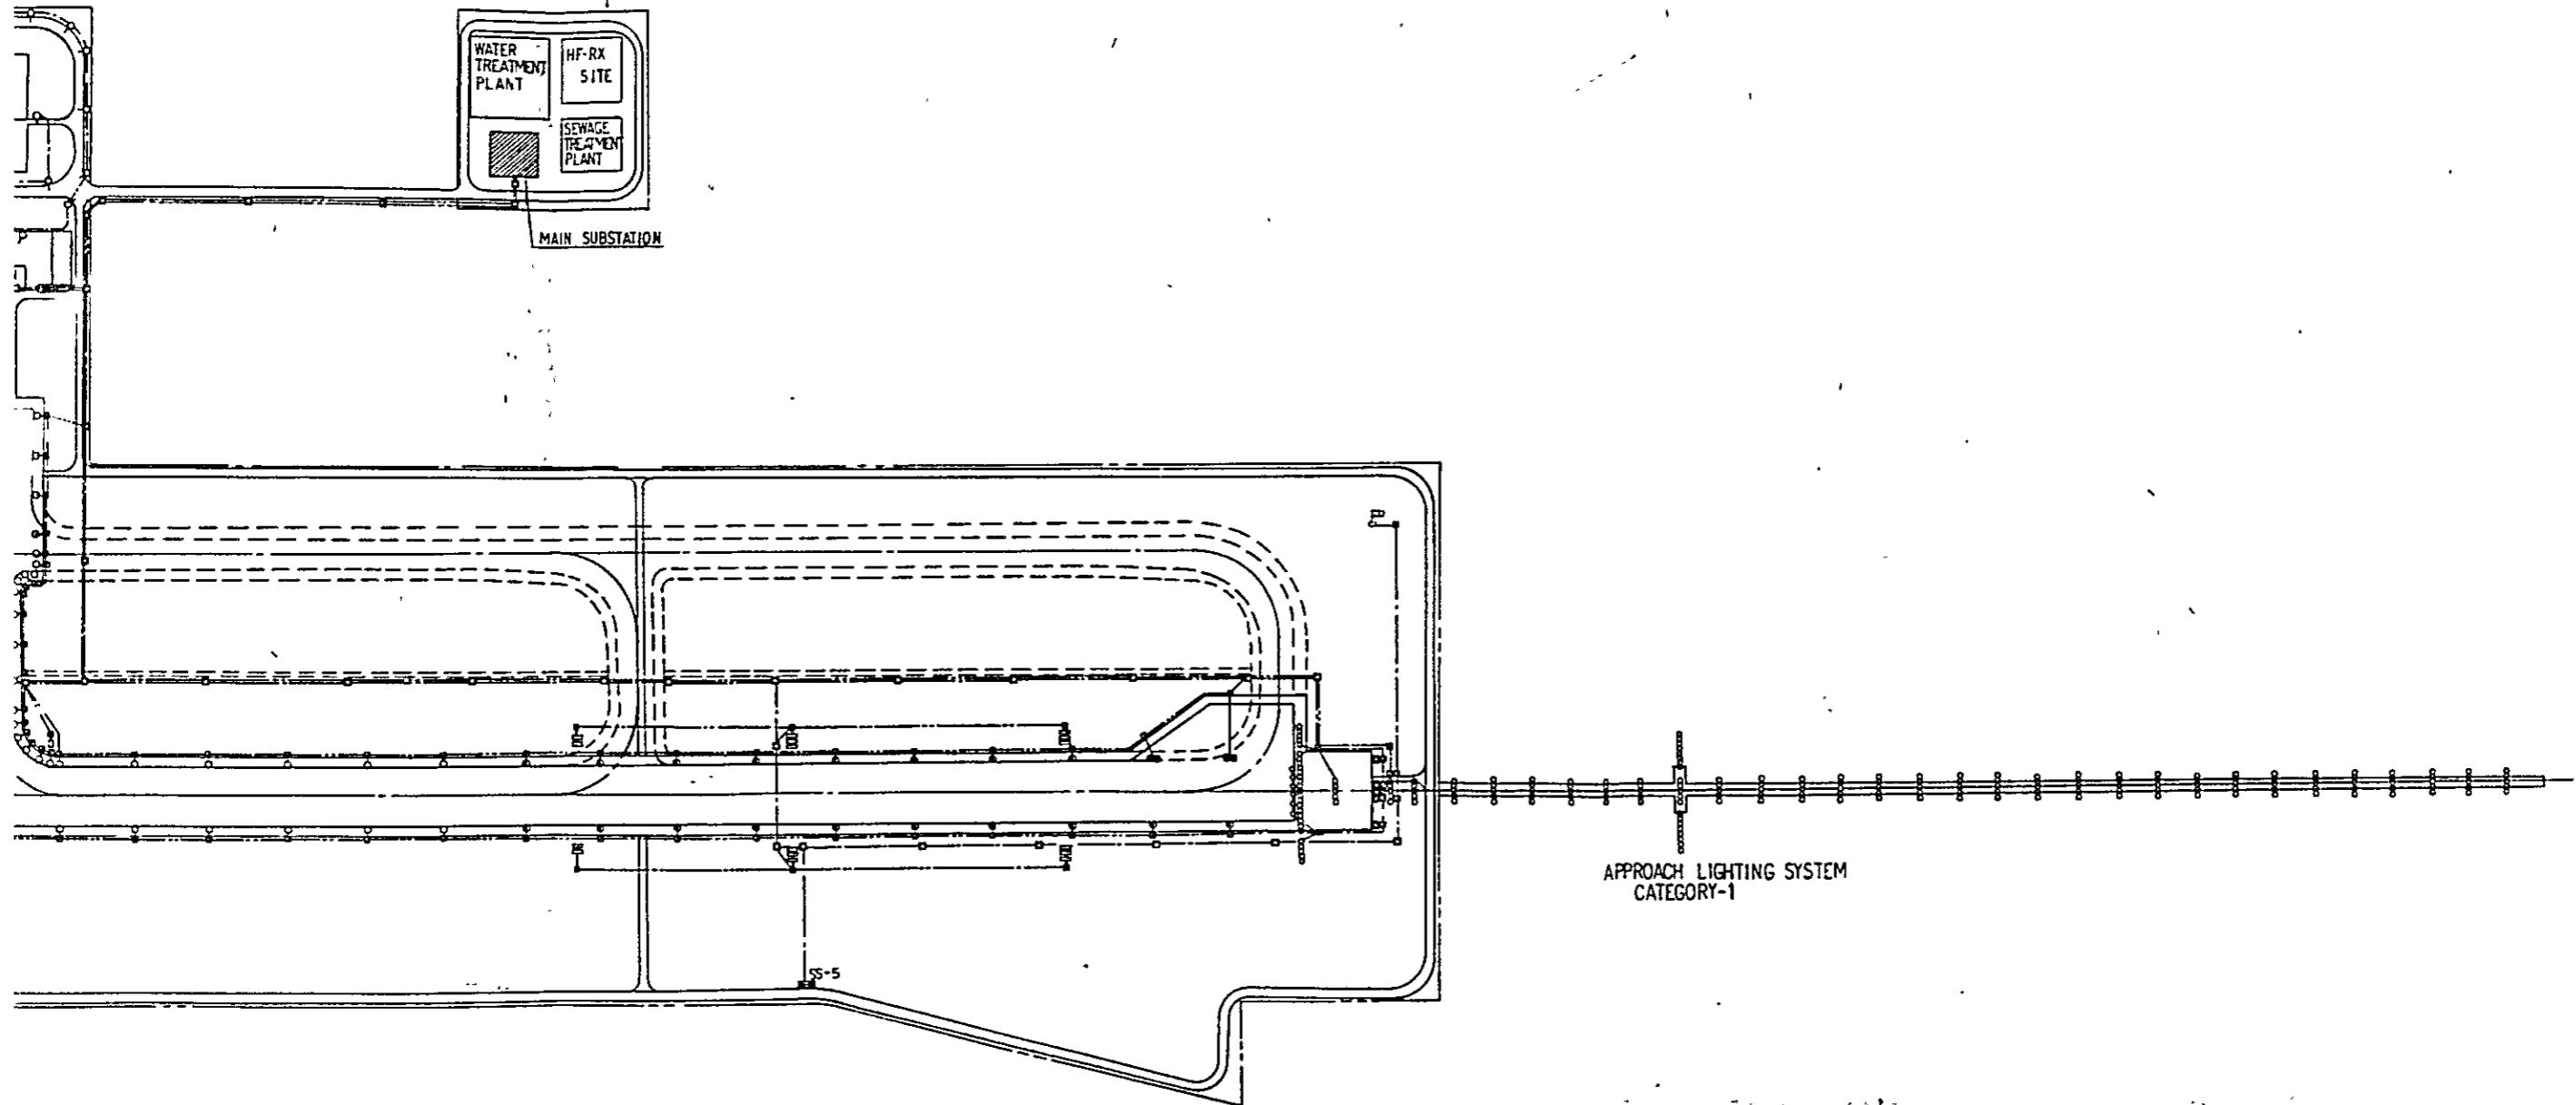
AERONAUTICAL GROUND LIGHTS LAYOUT PLAN
